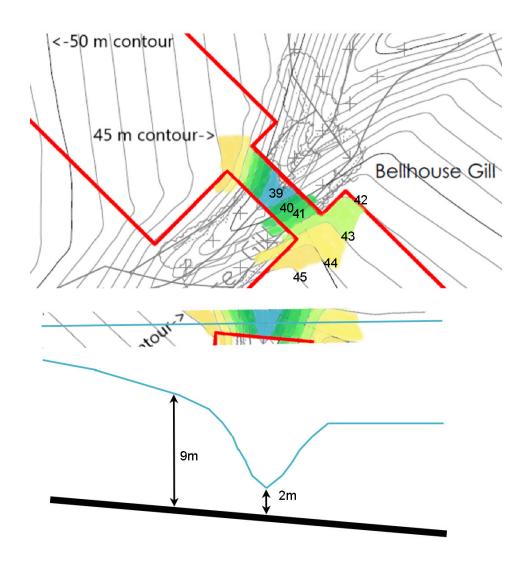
Annotated Extract of CD1.41 – Plan 869/AR/001 Rev C - Rail loading facility - Existing Plan and Topography showing estimated depth of top of conveyor below ground level
